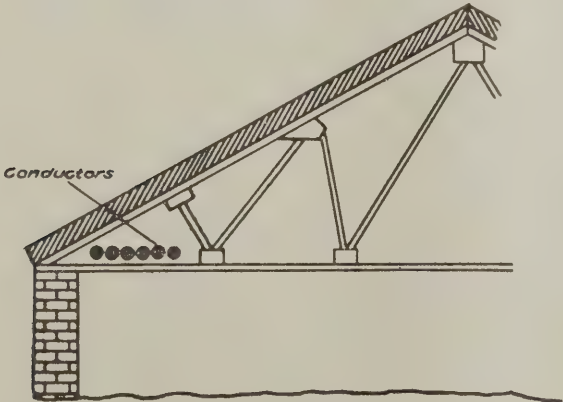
CONDUCTORS CARRIED ON ROOF TRUSS.
